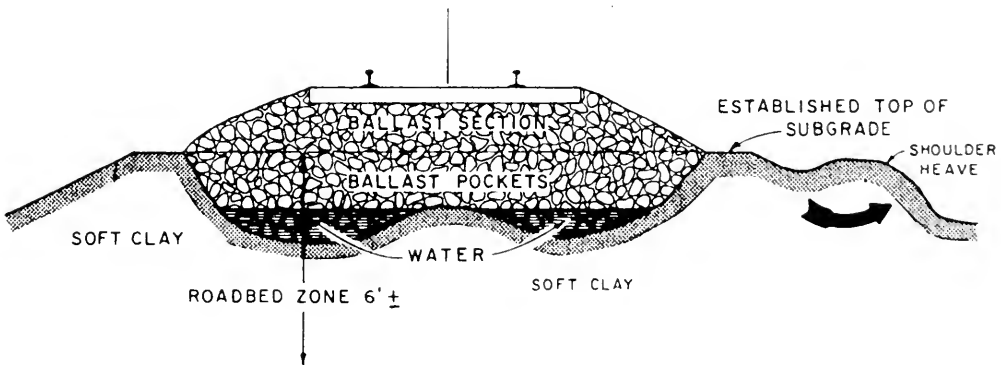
TYPICAL SECTION OF DISPLACED ROADBED AND BALLAST POCKET
